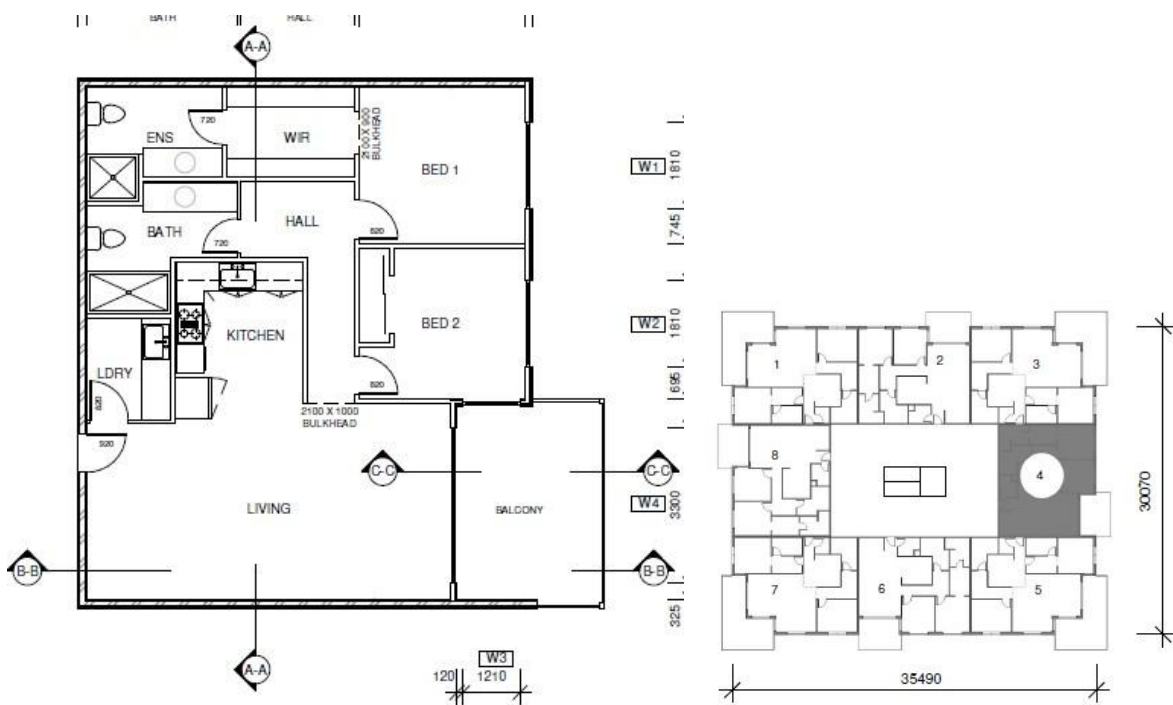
Apartment SBA610 - Floor Plan (Left) and location plan within the overall apartment building (right)
